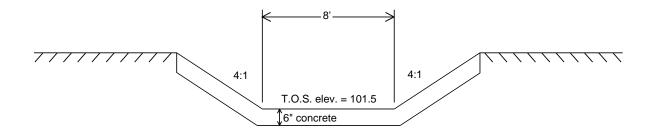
Concrete-lined flat-bottom ditch, section view
